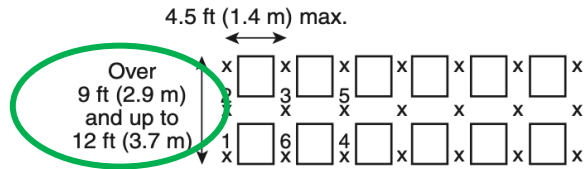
(e) Plan View of In-Rack Sprinkler Arrangement for Open Double-Row Racks Up to 12 ft (3.7 m) Deep.
